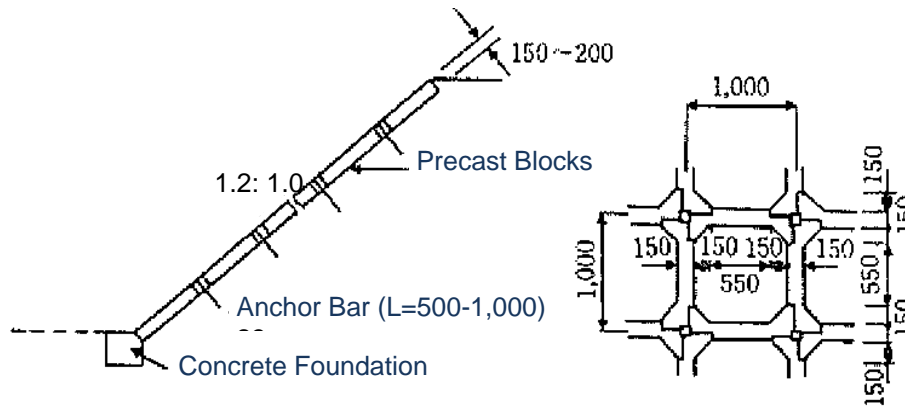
EXAMPLE OF CONCRETE PITCHING
